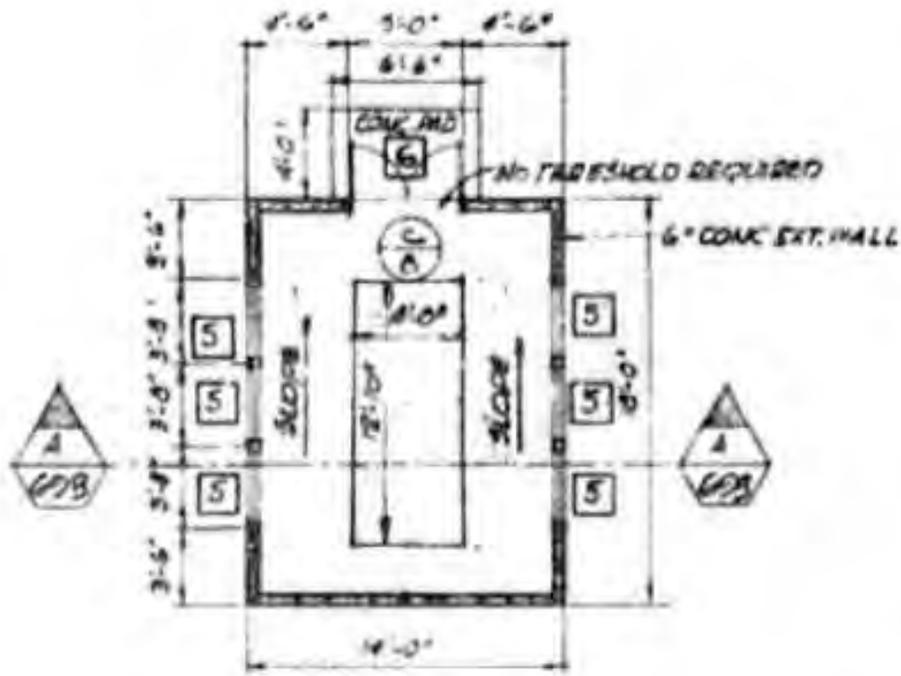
As Built plan view of the original NTTU generator building, Feature 3.
